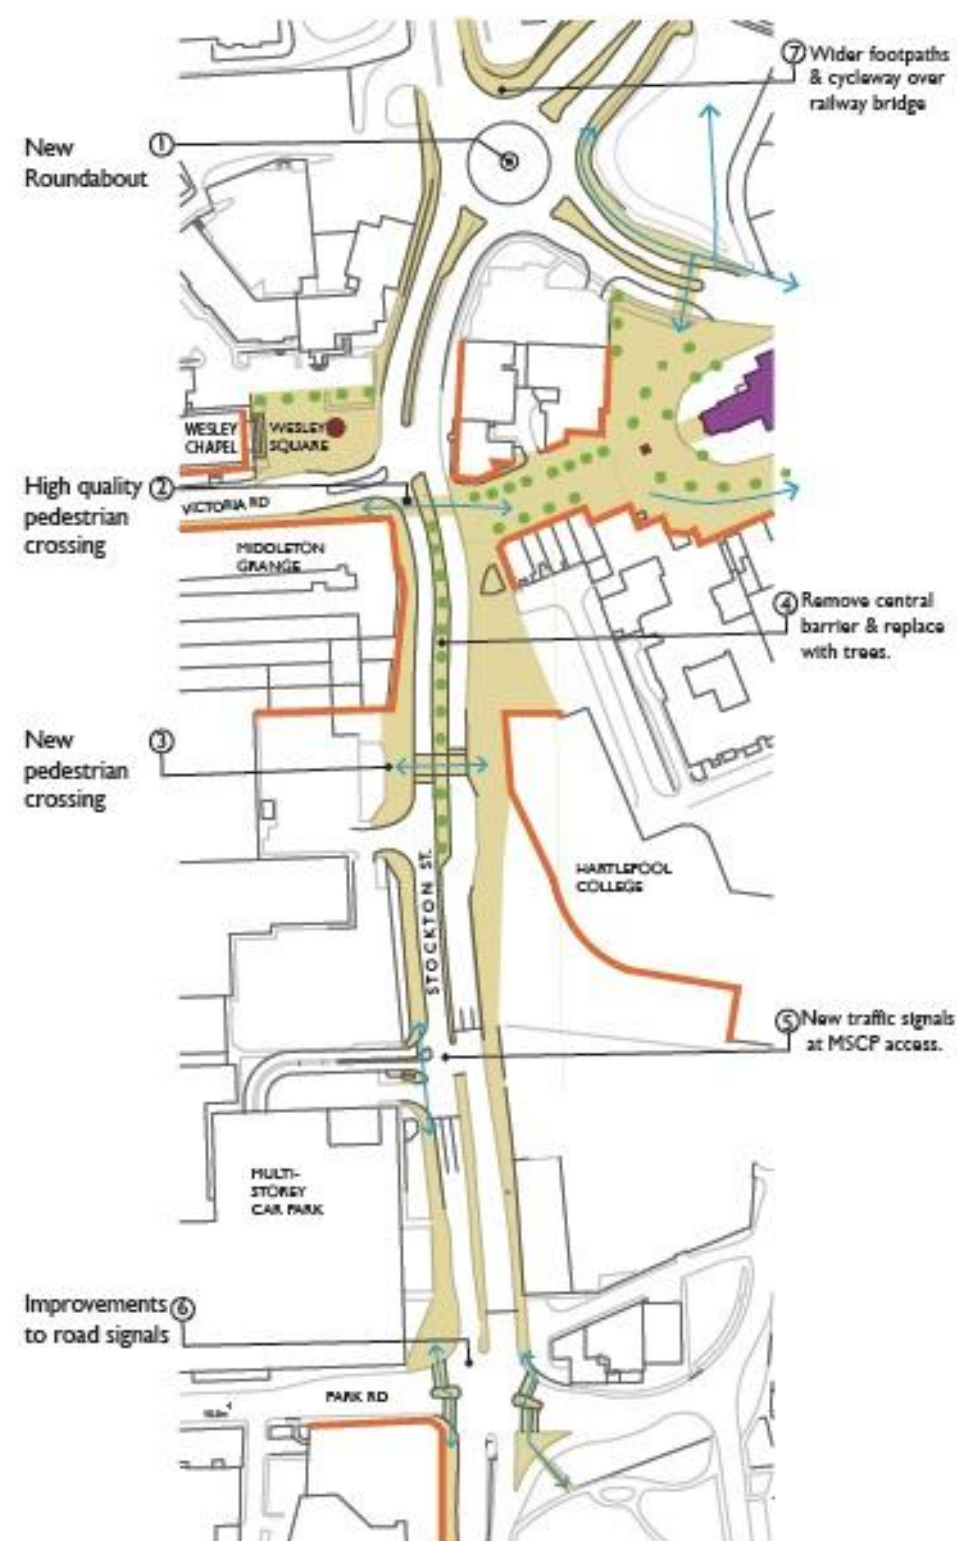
Indicative Potential Layout for Renewed Stockton Street
